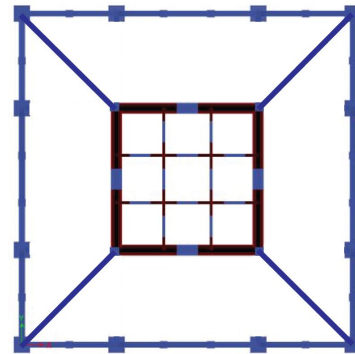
Plan view of diagonal oriented outrigger trusses
